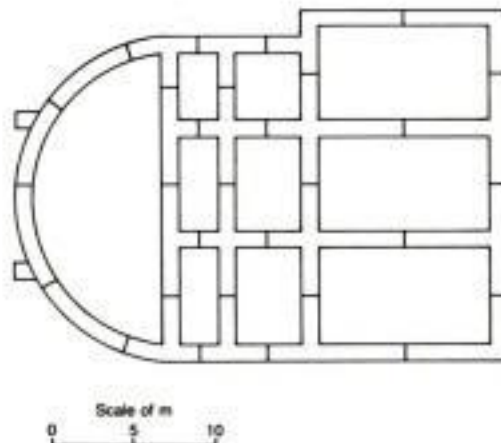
Redcar pumping station: panel layout to 1 m thick diaphragm walls spanning vertically between base slab and capping beam without bracing
